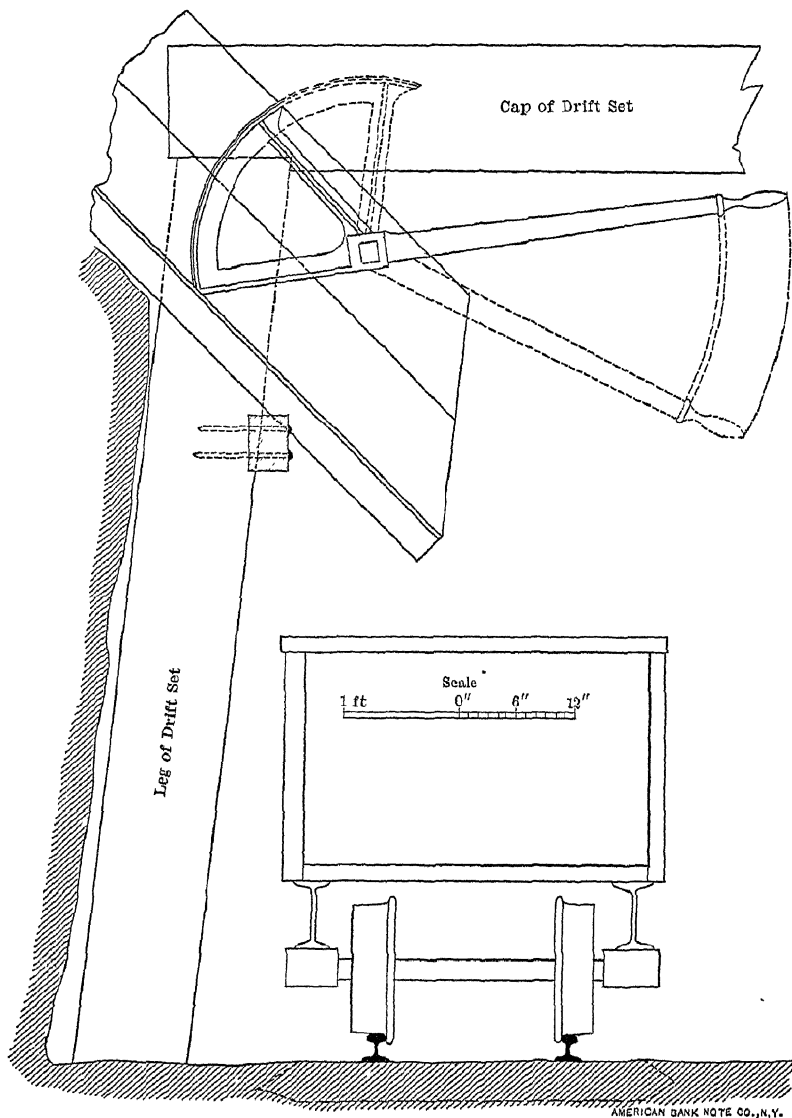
Standard Underground Chute used in the Fayal Mine.
